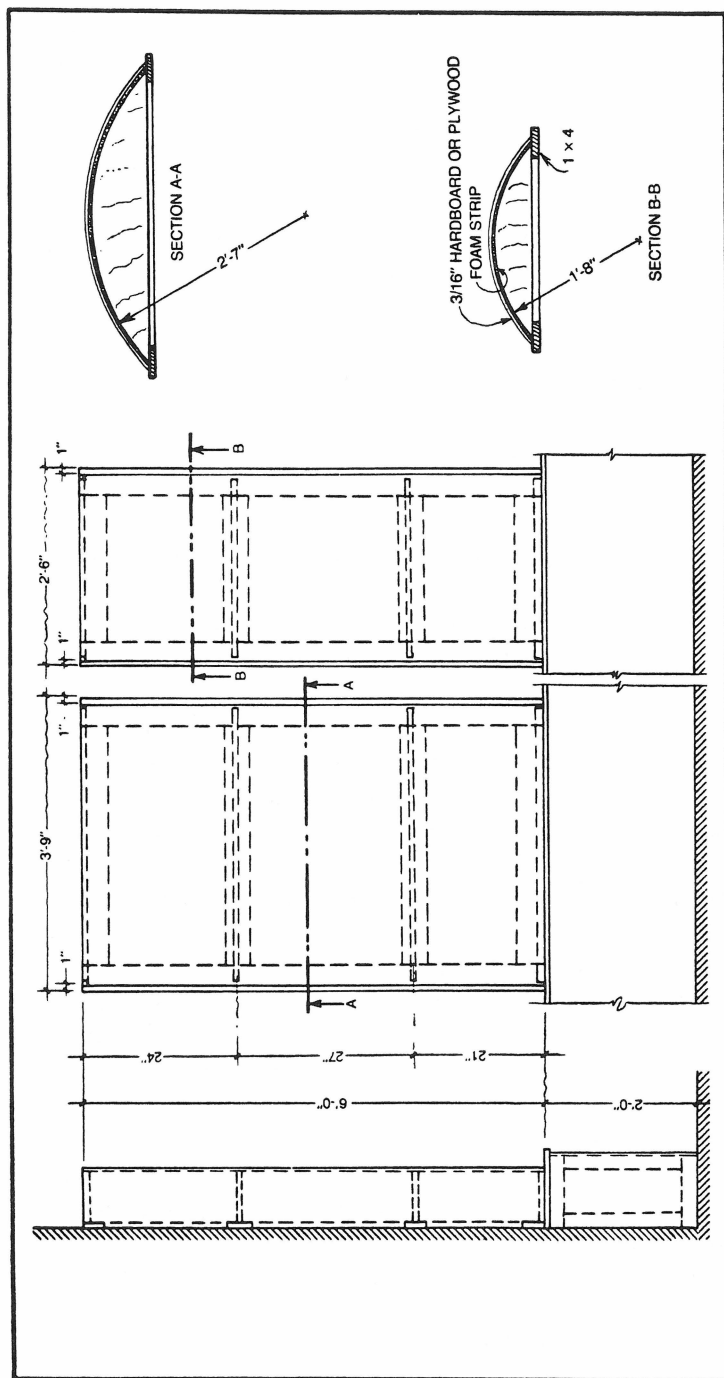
Construction details of polycylindrical diffusers/absorbers on west wall of music studio. They are fastened to the wall and rest on a simple base enclosed with plywood.
